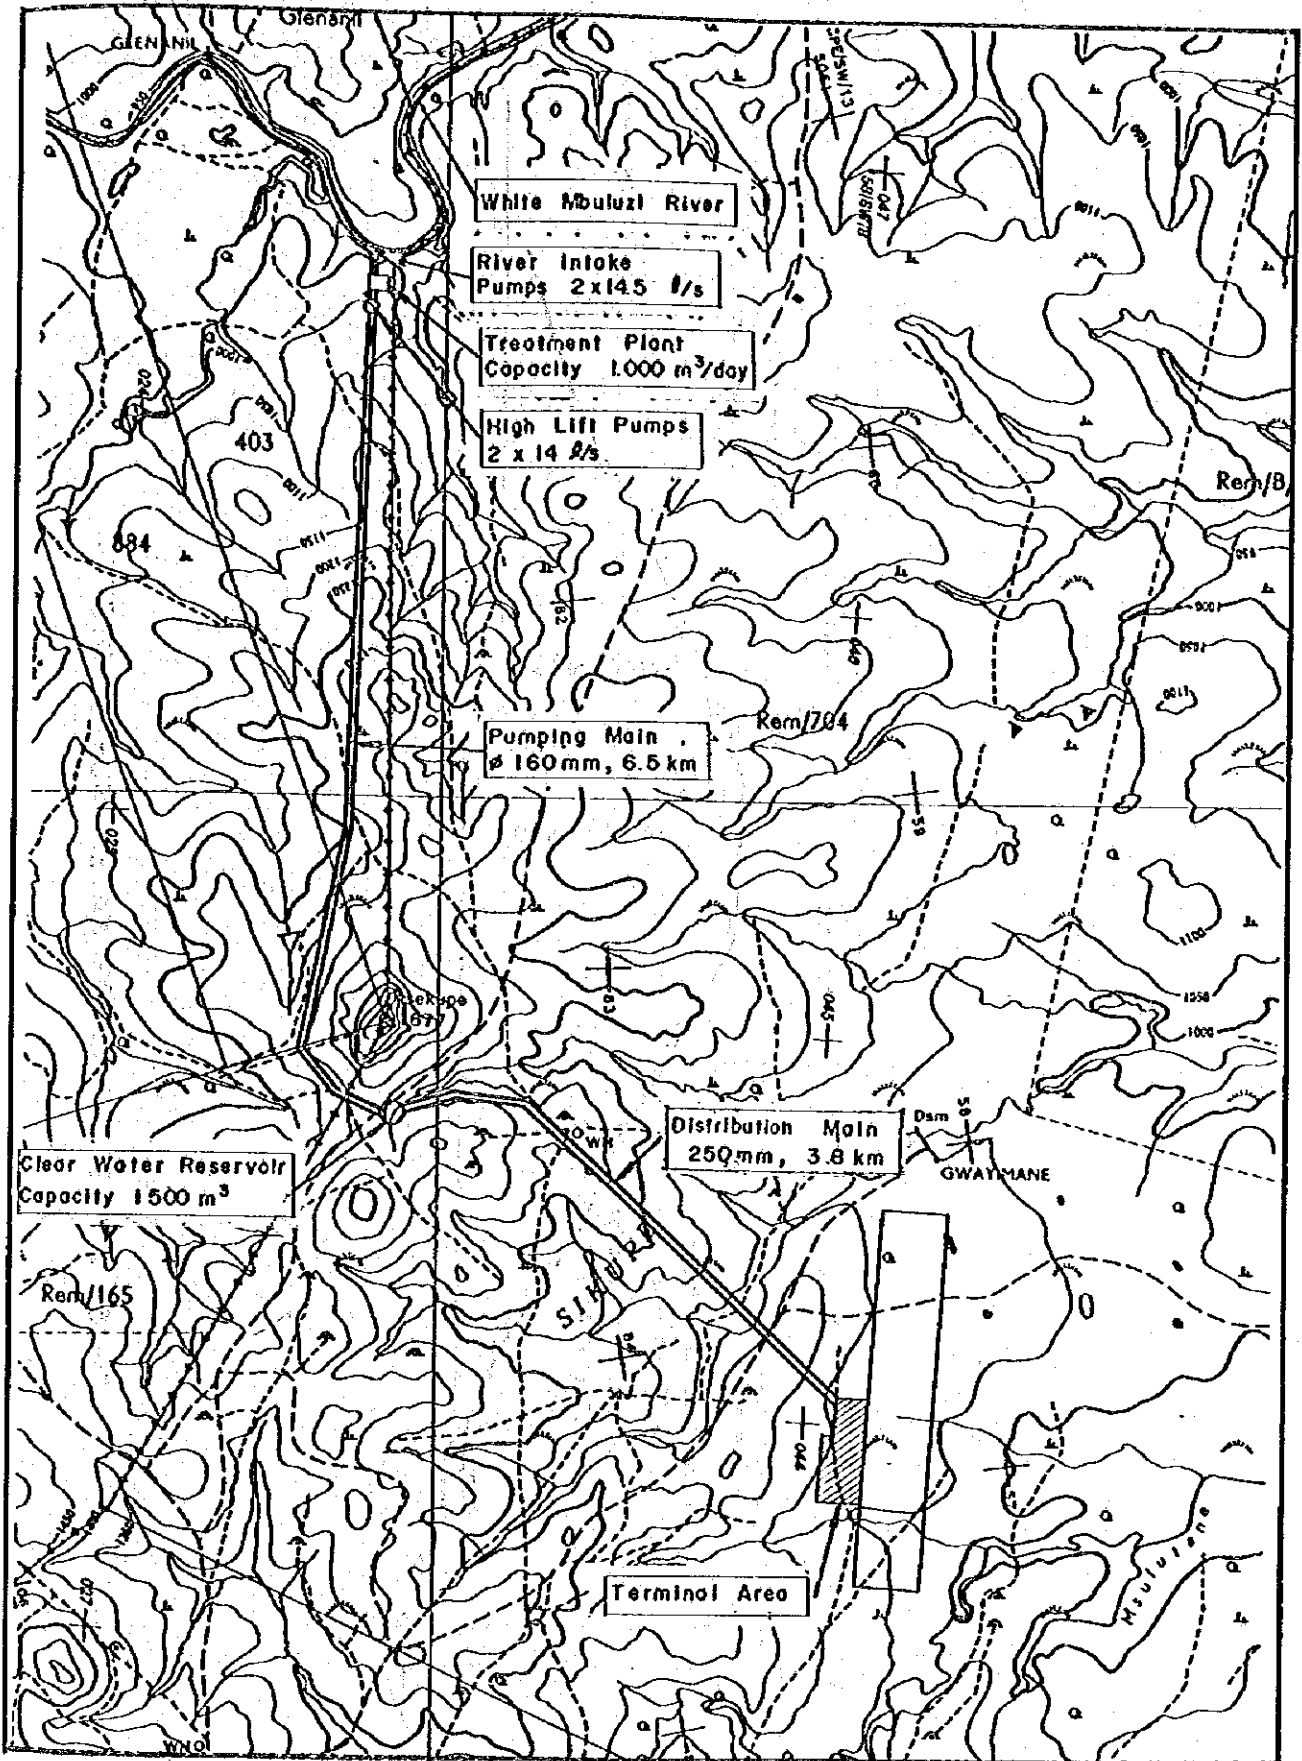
PLAN OF WATER SUPPLY SYSTEM
